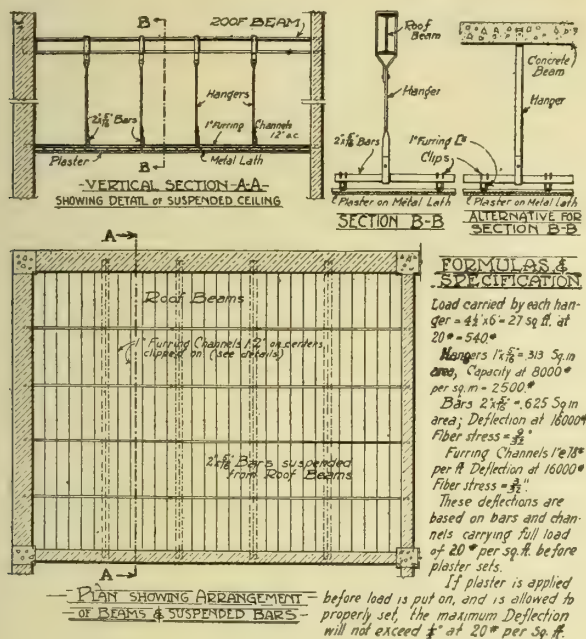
SUSPENDED CEILING CONSTRUCTION
